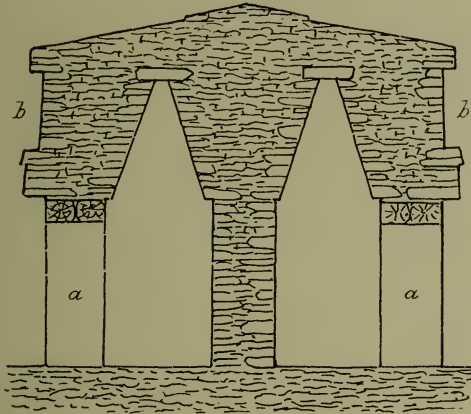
TRANSVERSE SECTION OF THE MURAL TABLET BUILDING.
